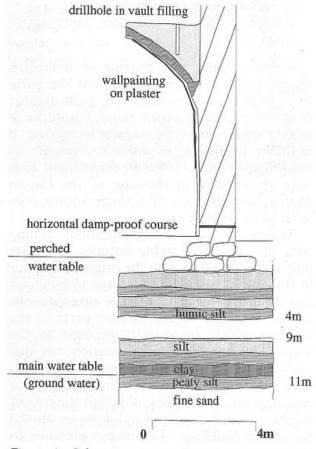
Schematic section through the ground, the foundations and the wall of the church showing the two water-tables.
